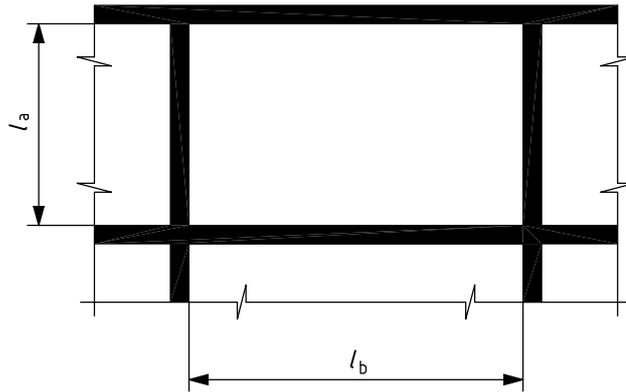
Edge panel with l_b parallel to edge of two-way slabs supported on girders, beams or walls
